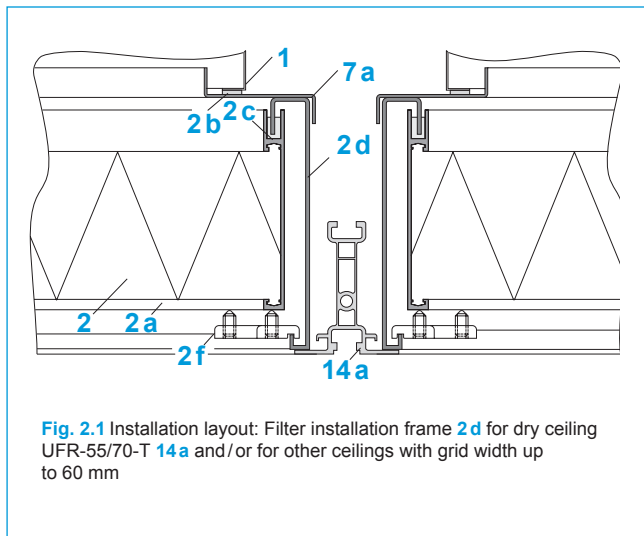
Installation layout: Filter installation frame 2d for dry ceiling UFR-55/70-T 14a and/or for other ceilings with grid width up to 60 mm
